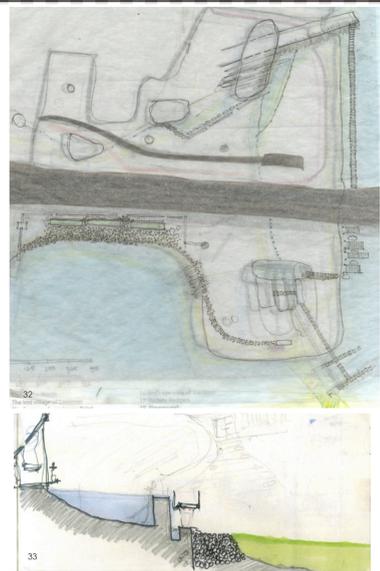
site study searching for new locations for building. Image 33 - study of site section illustrating the idea of a bathing pool on site. Image 34, page 24 - Floor plan of new building placement along historic edge. p.18
